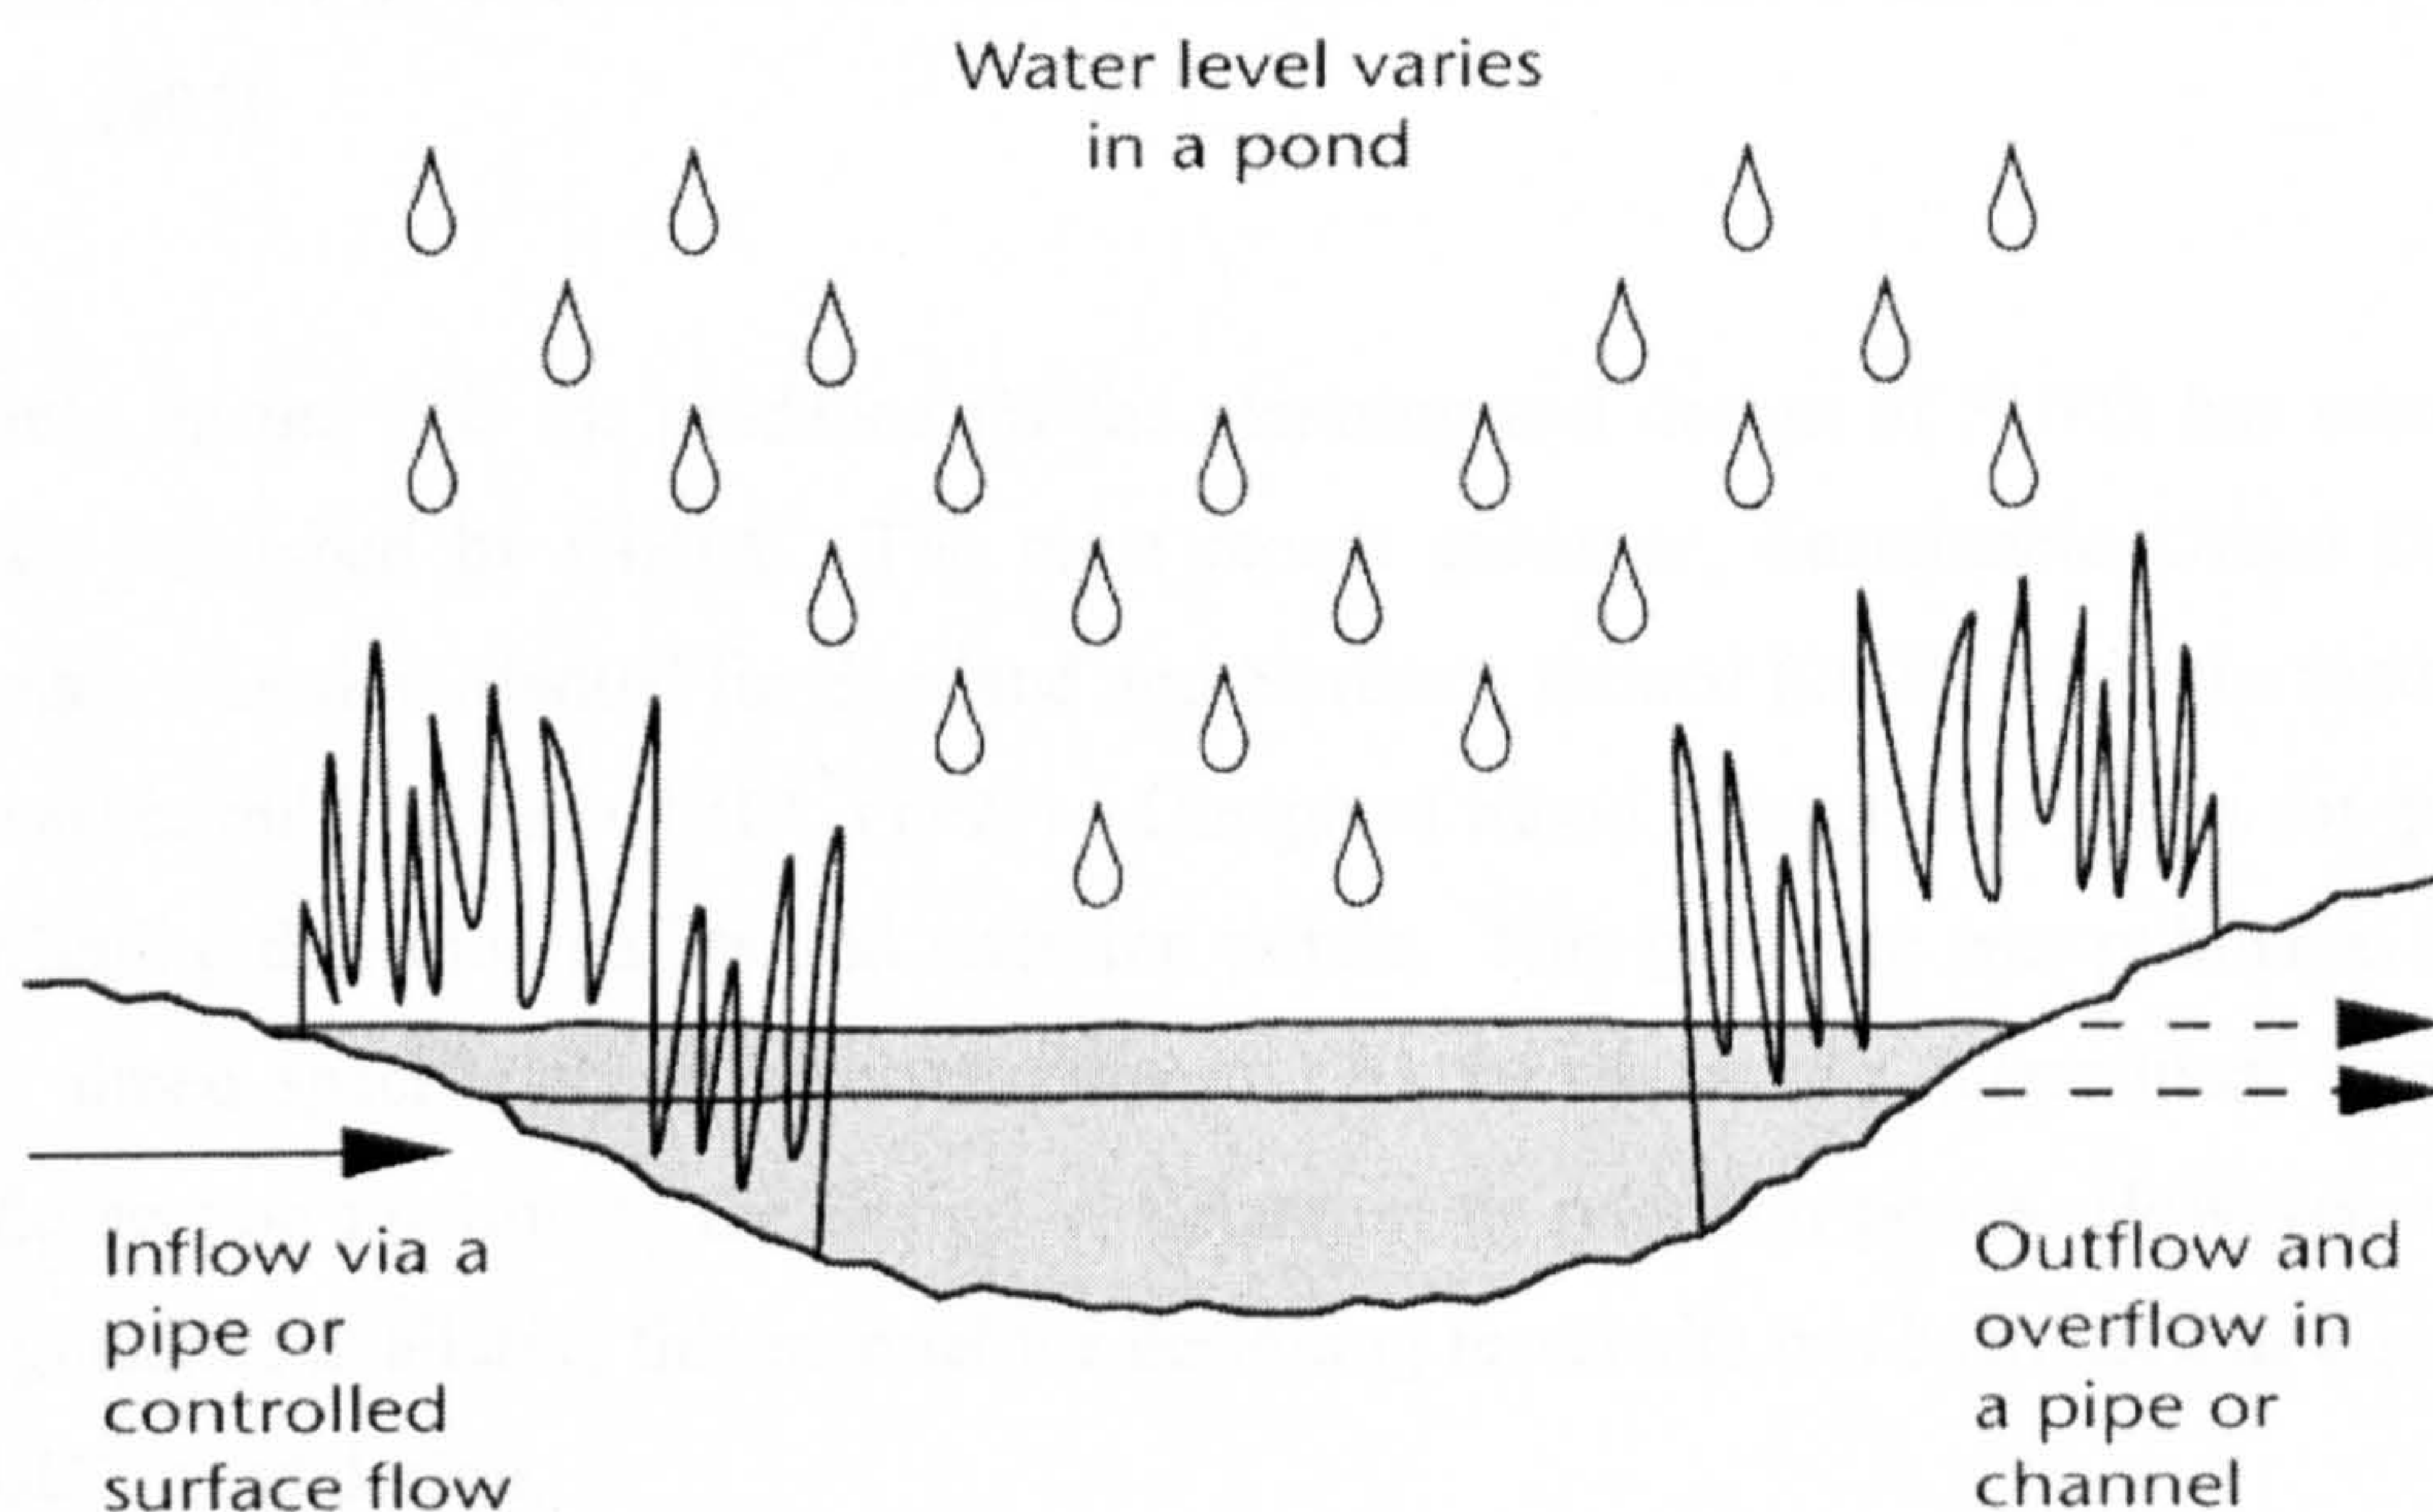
Cross section through a retention pond (Source: EA, 2004).
